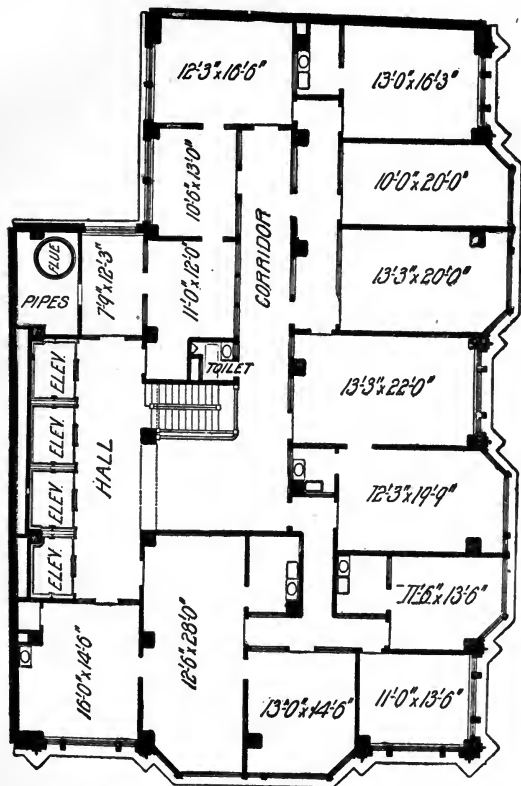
Reliance Building, Chicago. Typical Office-floor Plan.
